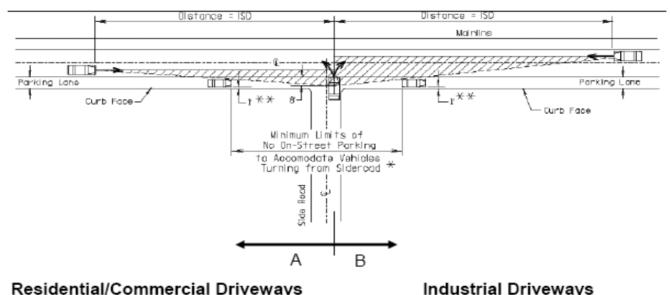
Driveway Vision Corners on Arterial and Collector Streets
